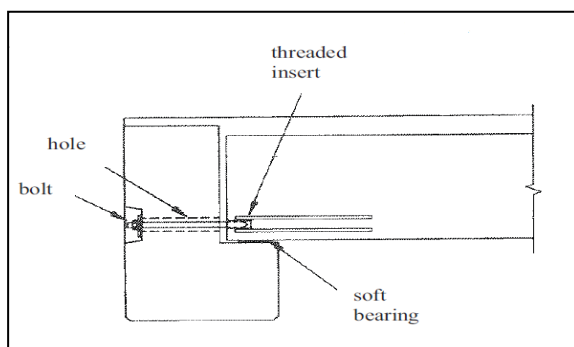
Structural steel inserts for precast connections (Building and Construction Authority (BCA) 1999)
